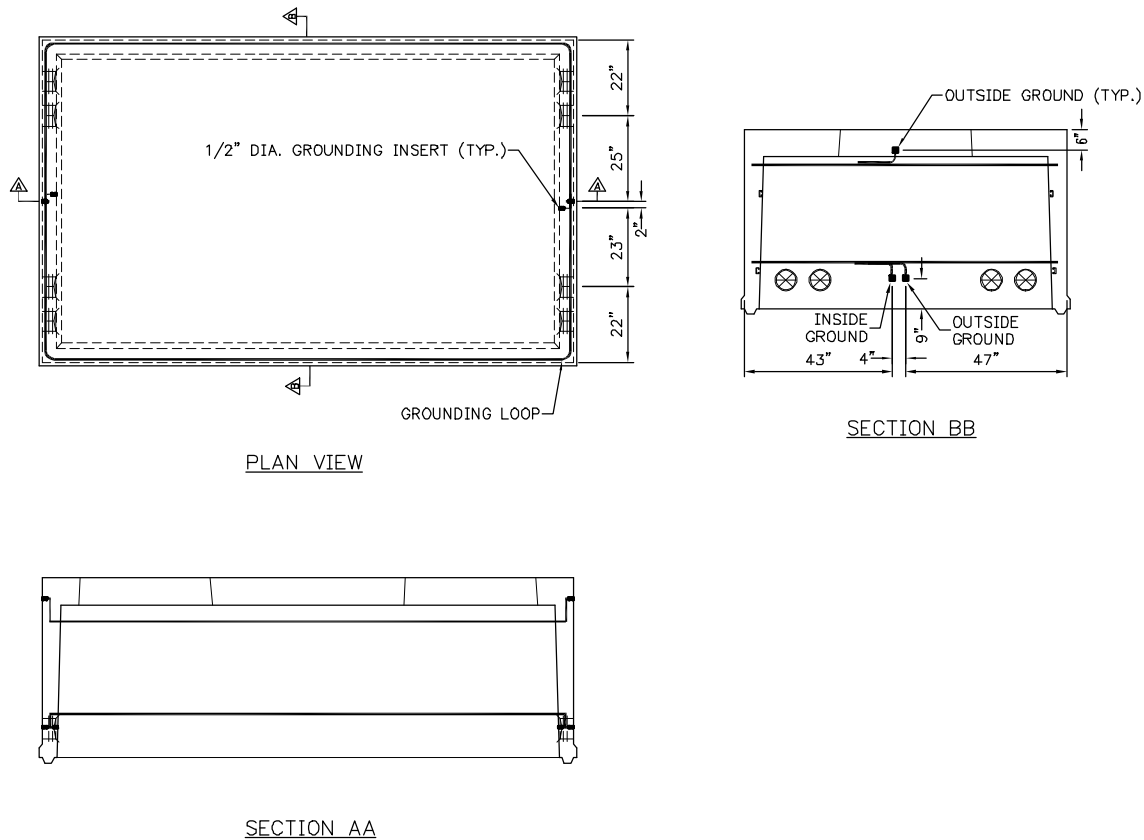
7' × 12' (94" × 155") Manhole Top Section Ground Grid
